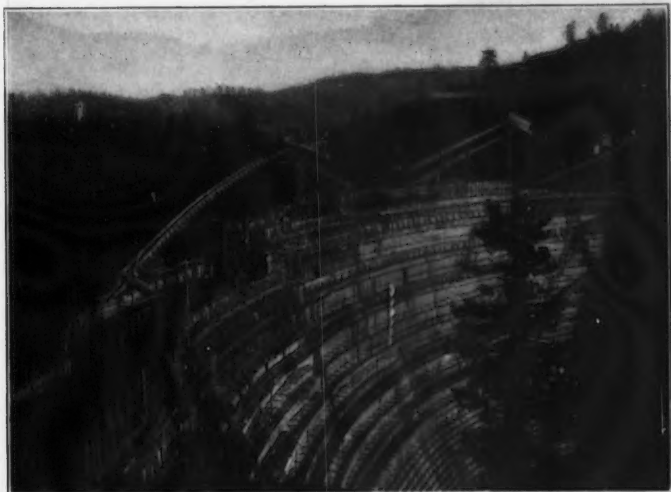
DOWN-STREAM VIEW OF LAKE SPAULDING DAM, SHOWING THE STEPPING-OFF AND IRON RODS FOR BOND.
